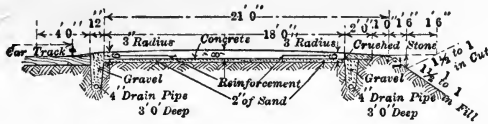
Typical Concrete Road and Street Cross-sections with Curb and Gutter.
